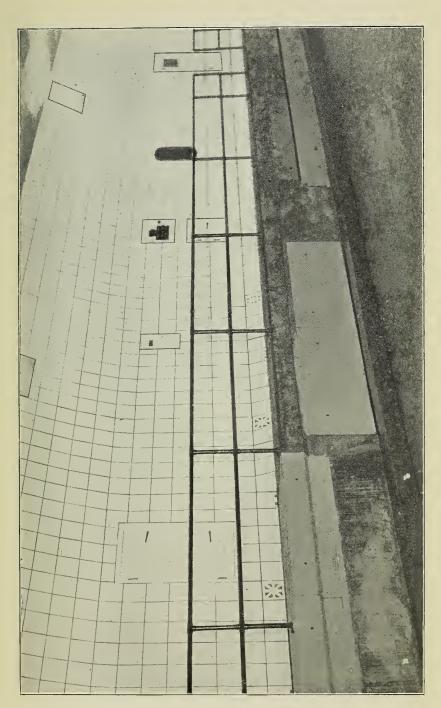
PLATE VII.—SIGNAL CONTROL NICHE GROUP IN NORTH WALL OF TUNNEL.
